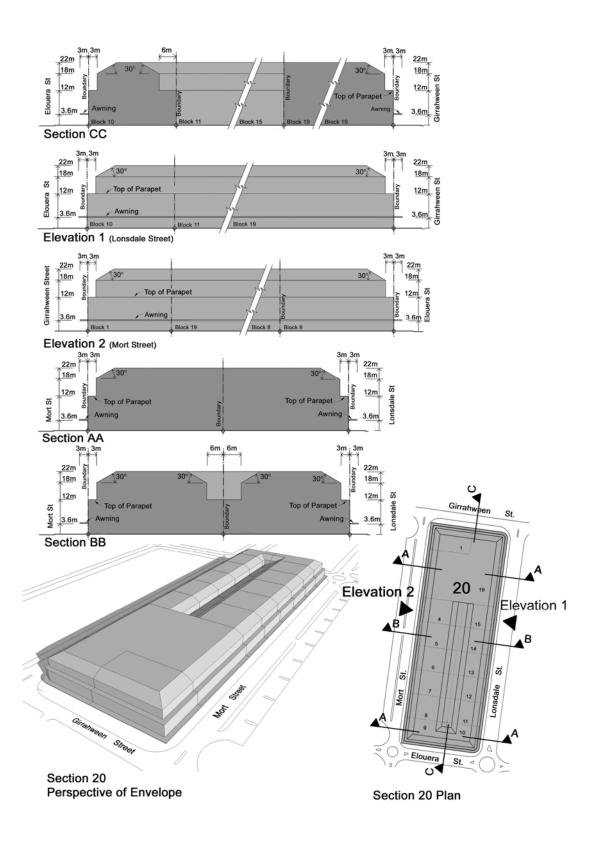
Building Envelope Diagram - Braddon Section 20 (CZ3 Zone)
